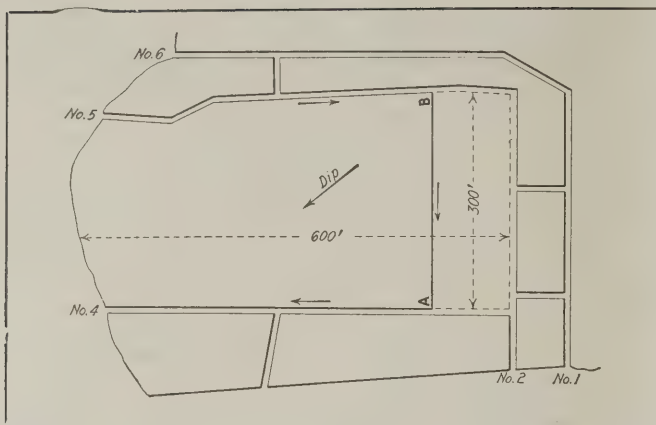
Full Retreating Longwall Wouldn't Work Here
